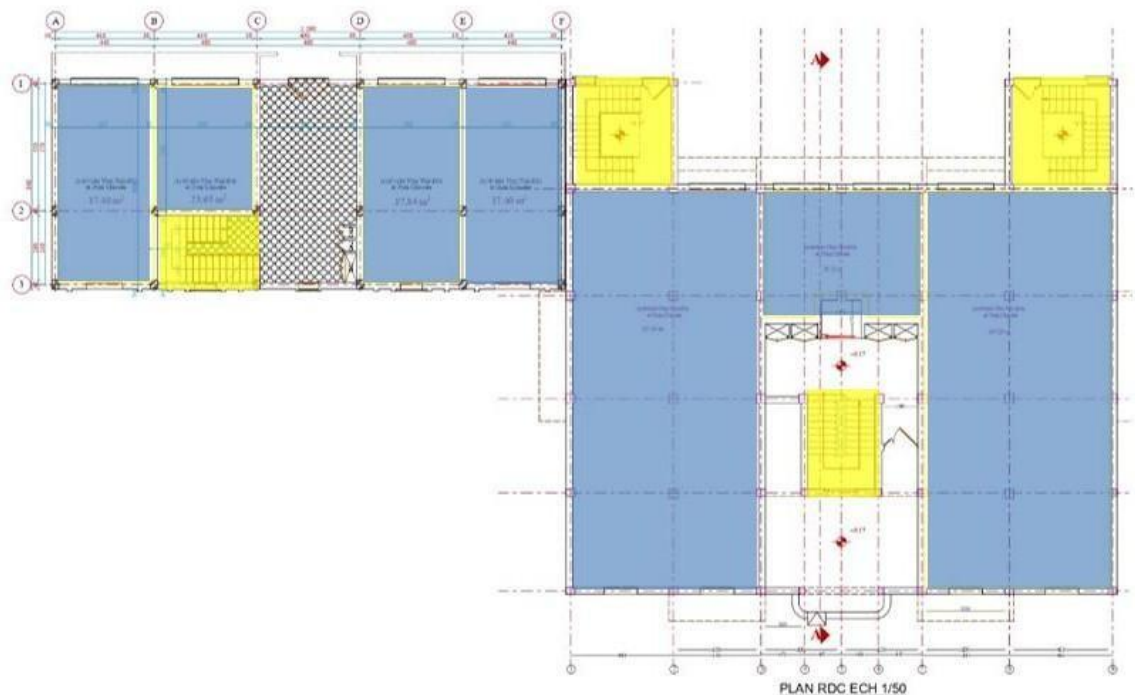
Section of Corner Block (Source: design office Nebar Omar +Author treatment , 2025).
